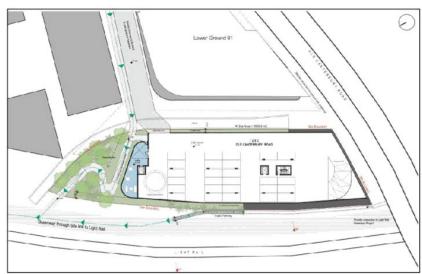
Floorplan Showing Through Site Link from McGill St Note - the means of access from McGill Street to the subject site is only available through a vehicular laneway located on 120 B Canterbury Road for which the applicant has a right of way.
